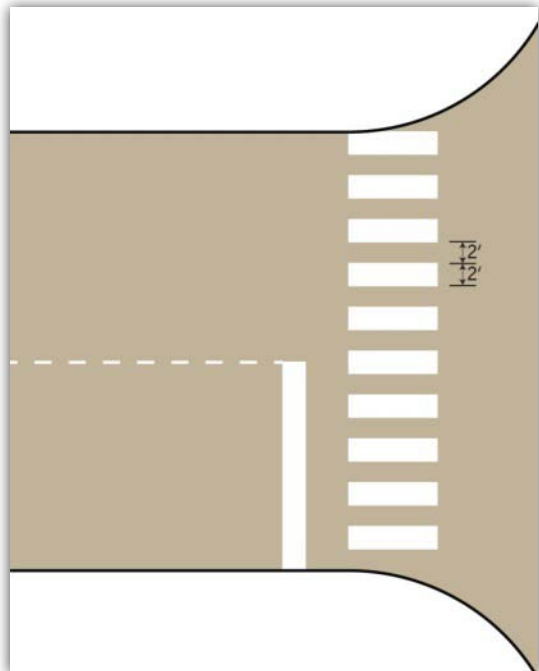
Standard Continental Crosswalk from the Chicago Pedestrian Plan
